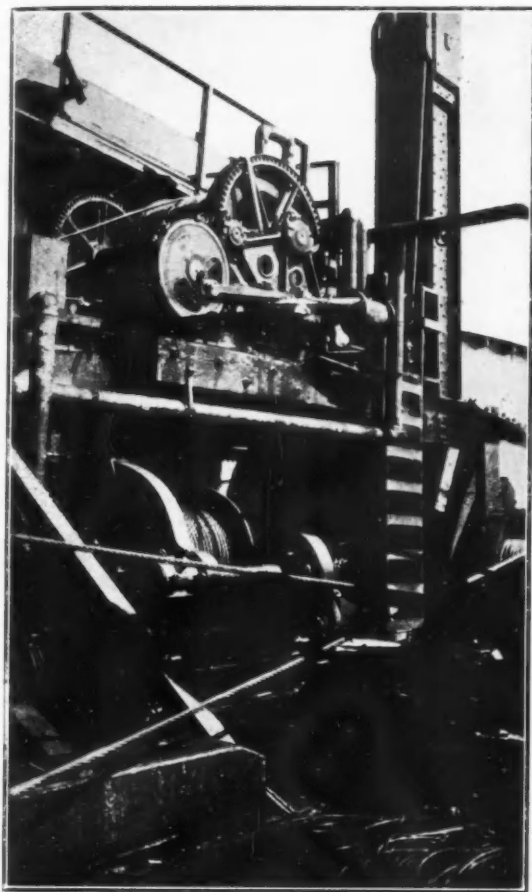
View of Structural Steel Spud on Drill Boat, with Independent Hoisting Engine.
